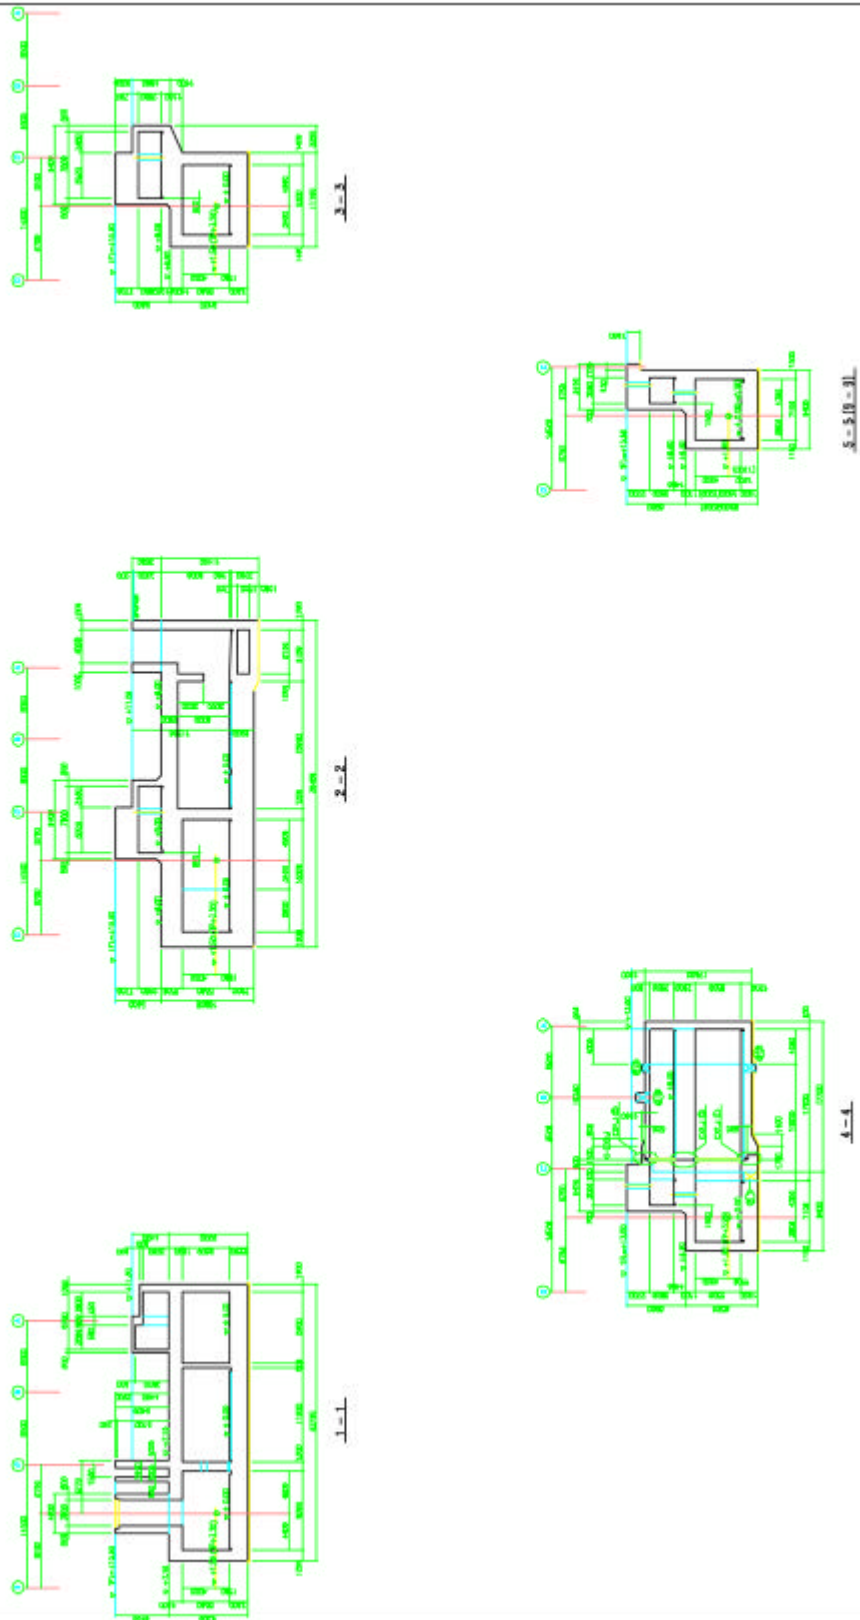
Cross Sectional View of LINAC Tunnel (1)
